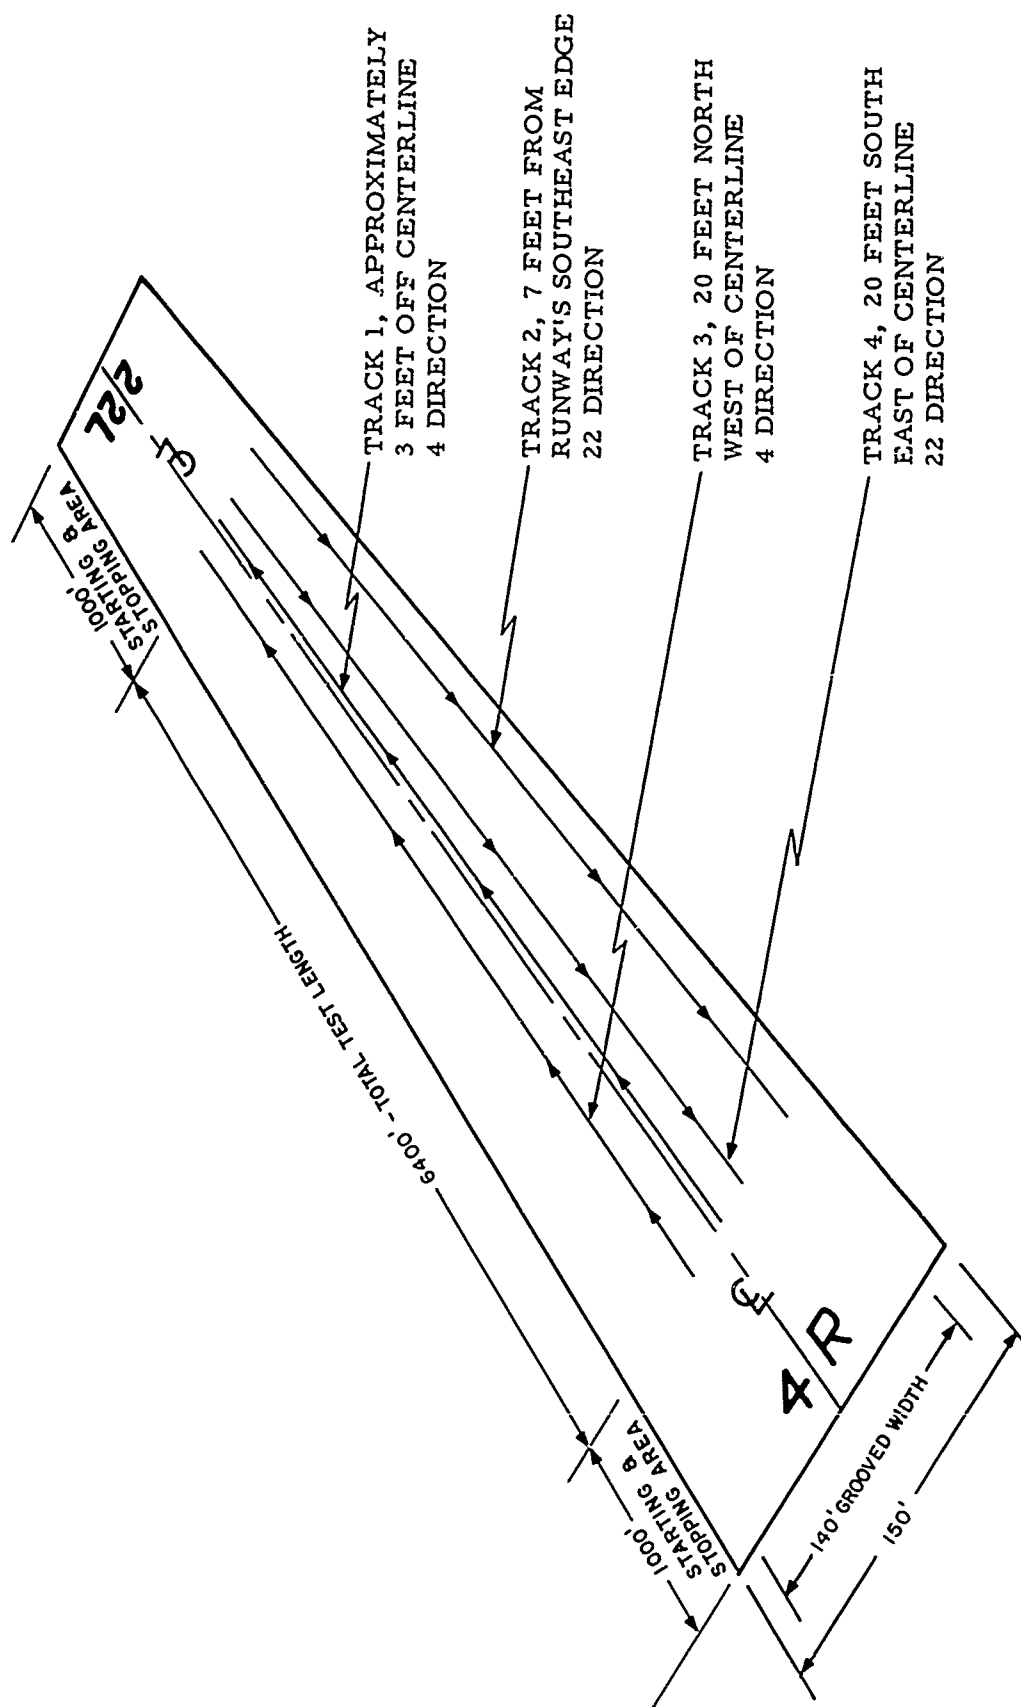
RUNWAY 4R-22L TEST TRACK CONFIGURATION
